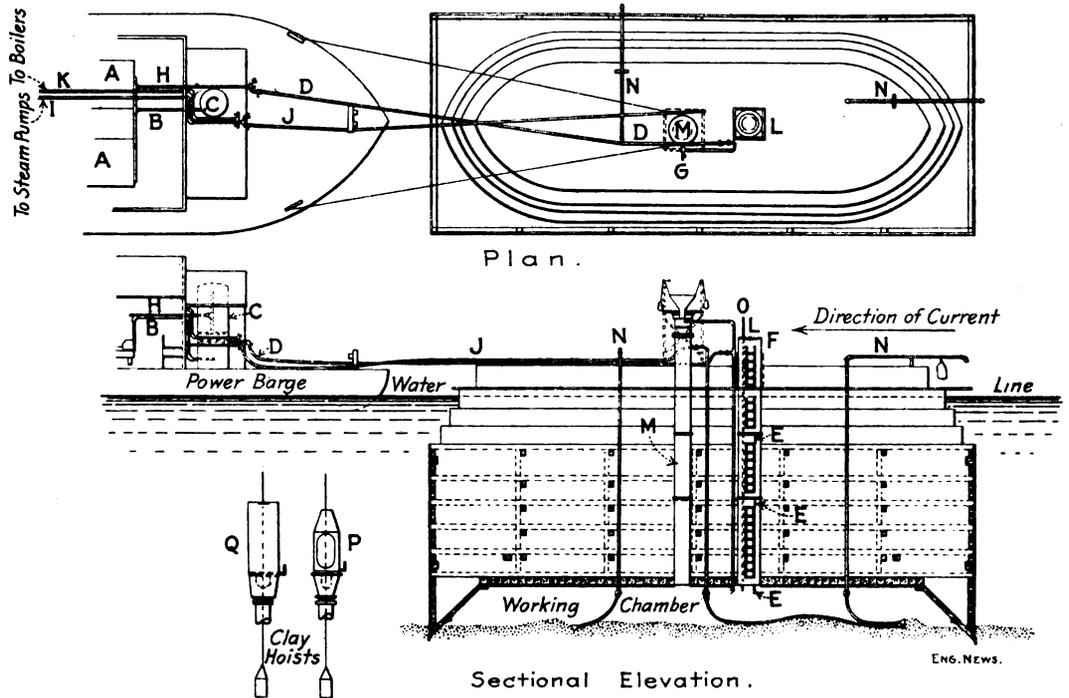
ARRANGEMENT OF THE CONSTRUCTION PLANT FOR SINKING THE CAISSONS.
